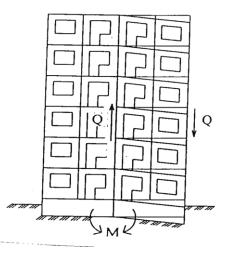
Building deformation behavior under wall panels tilting caused by foundation distortion.
